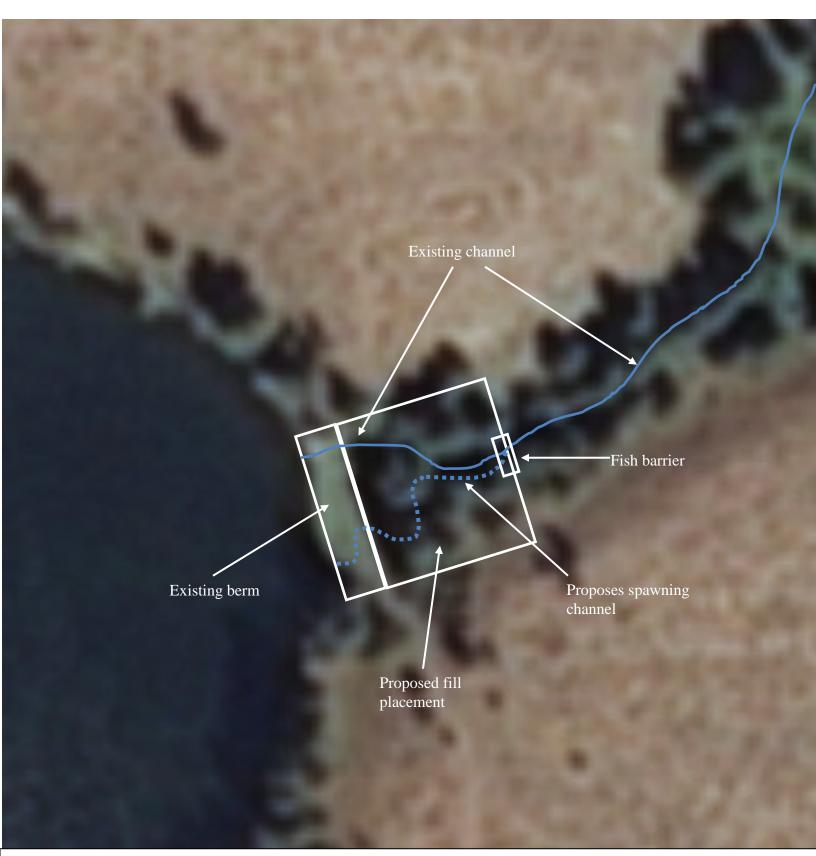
Aerial view of proposed fish barrier and spawning channel at the outlet of Van Houten Lake.
